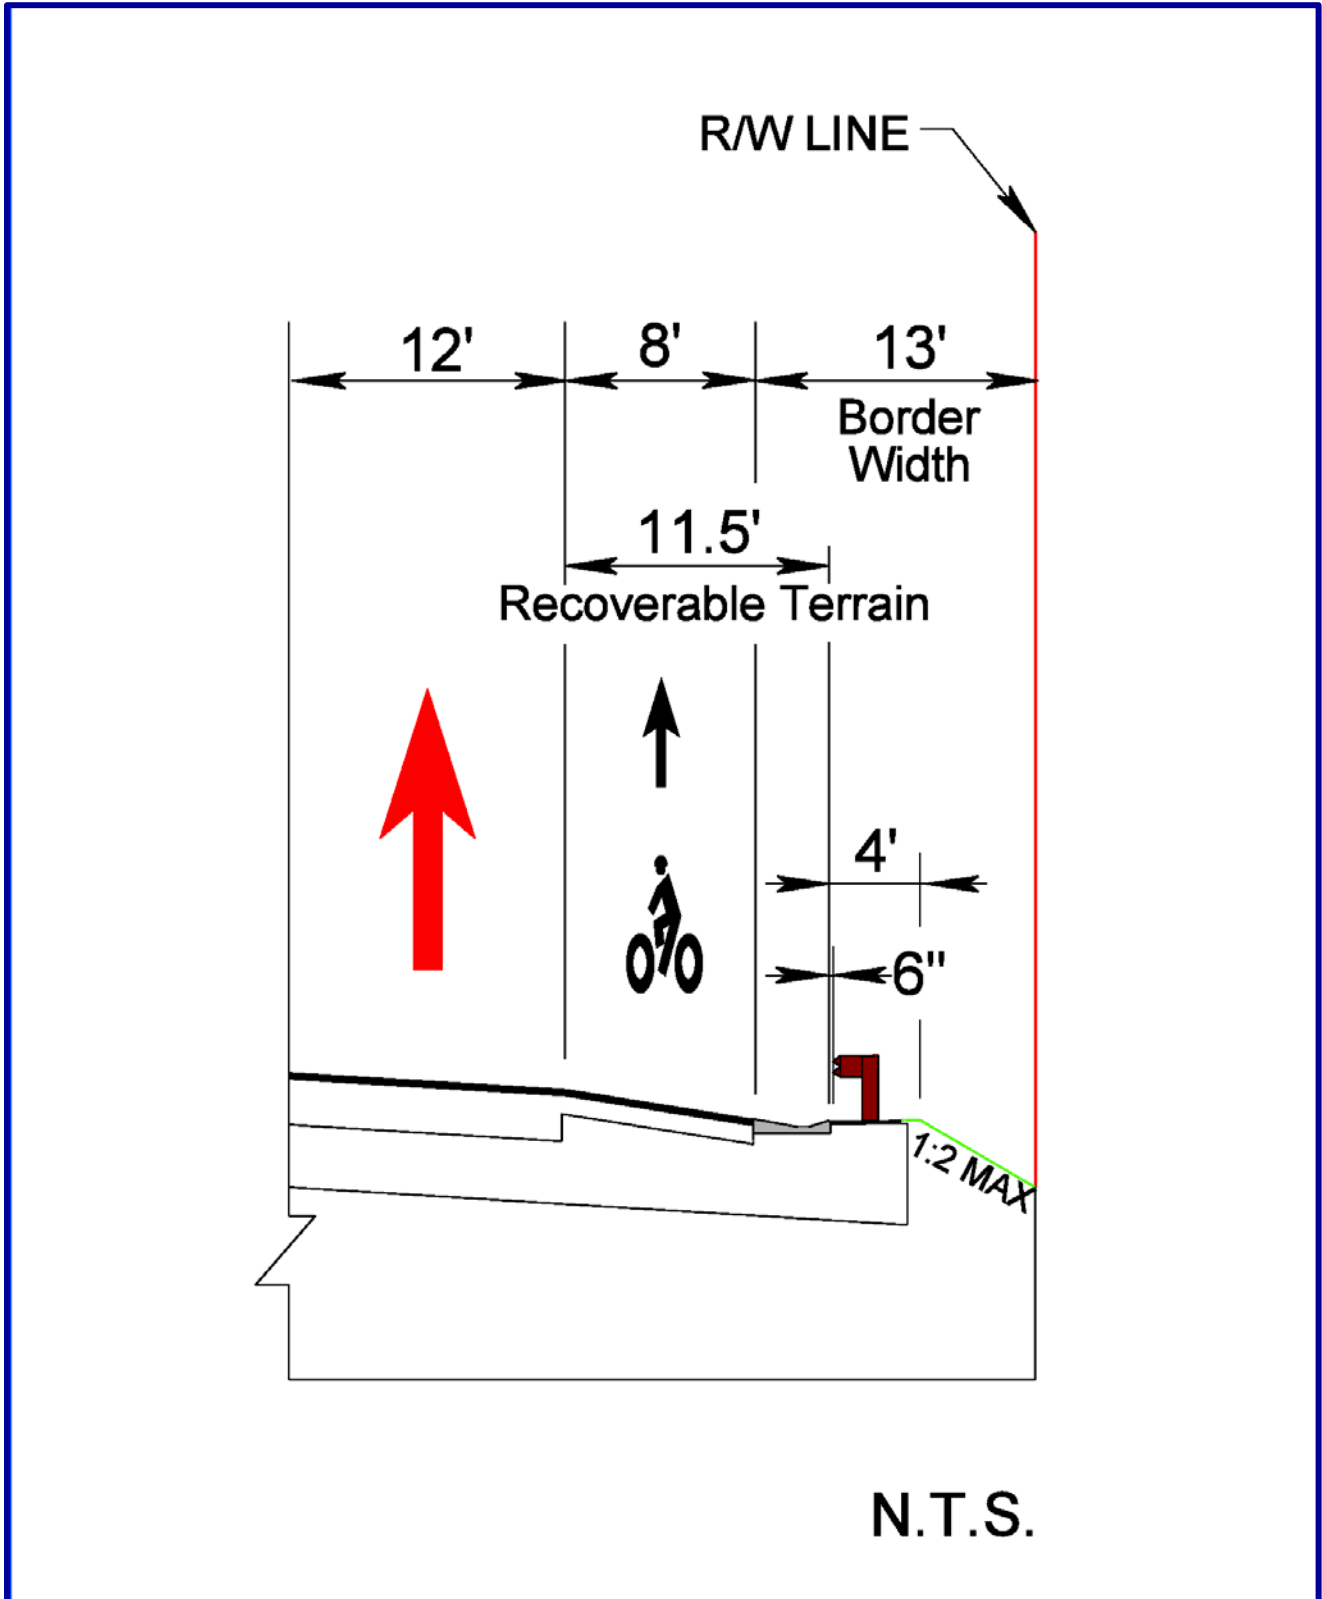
Proposed Owaissa Bauer Minimization Treatment (Typical)
